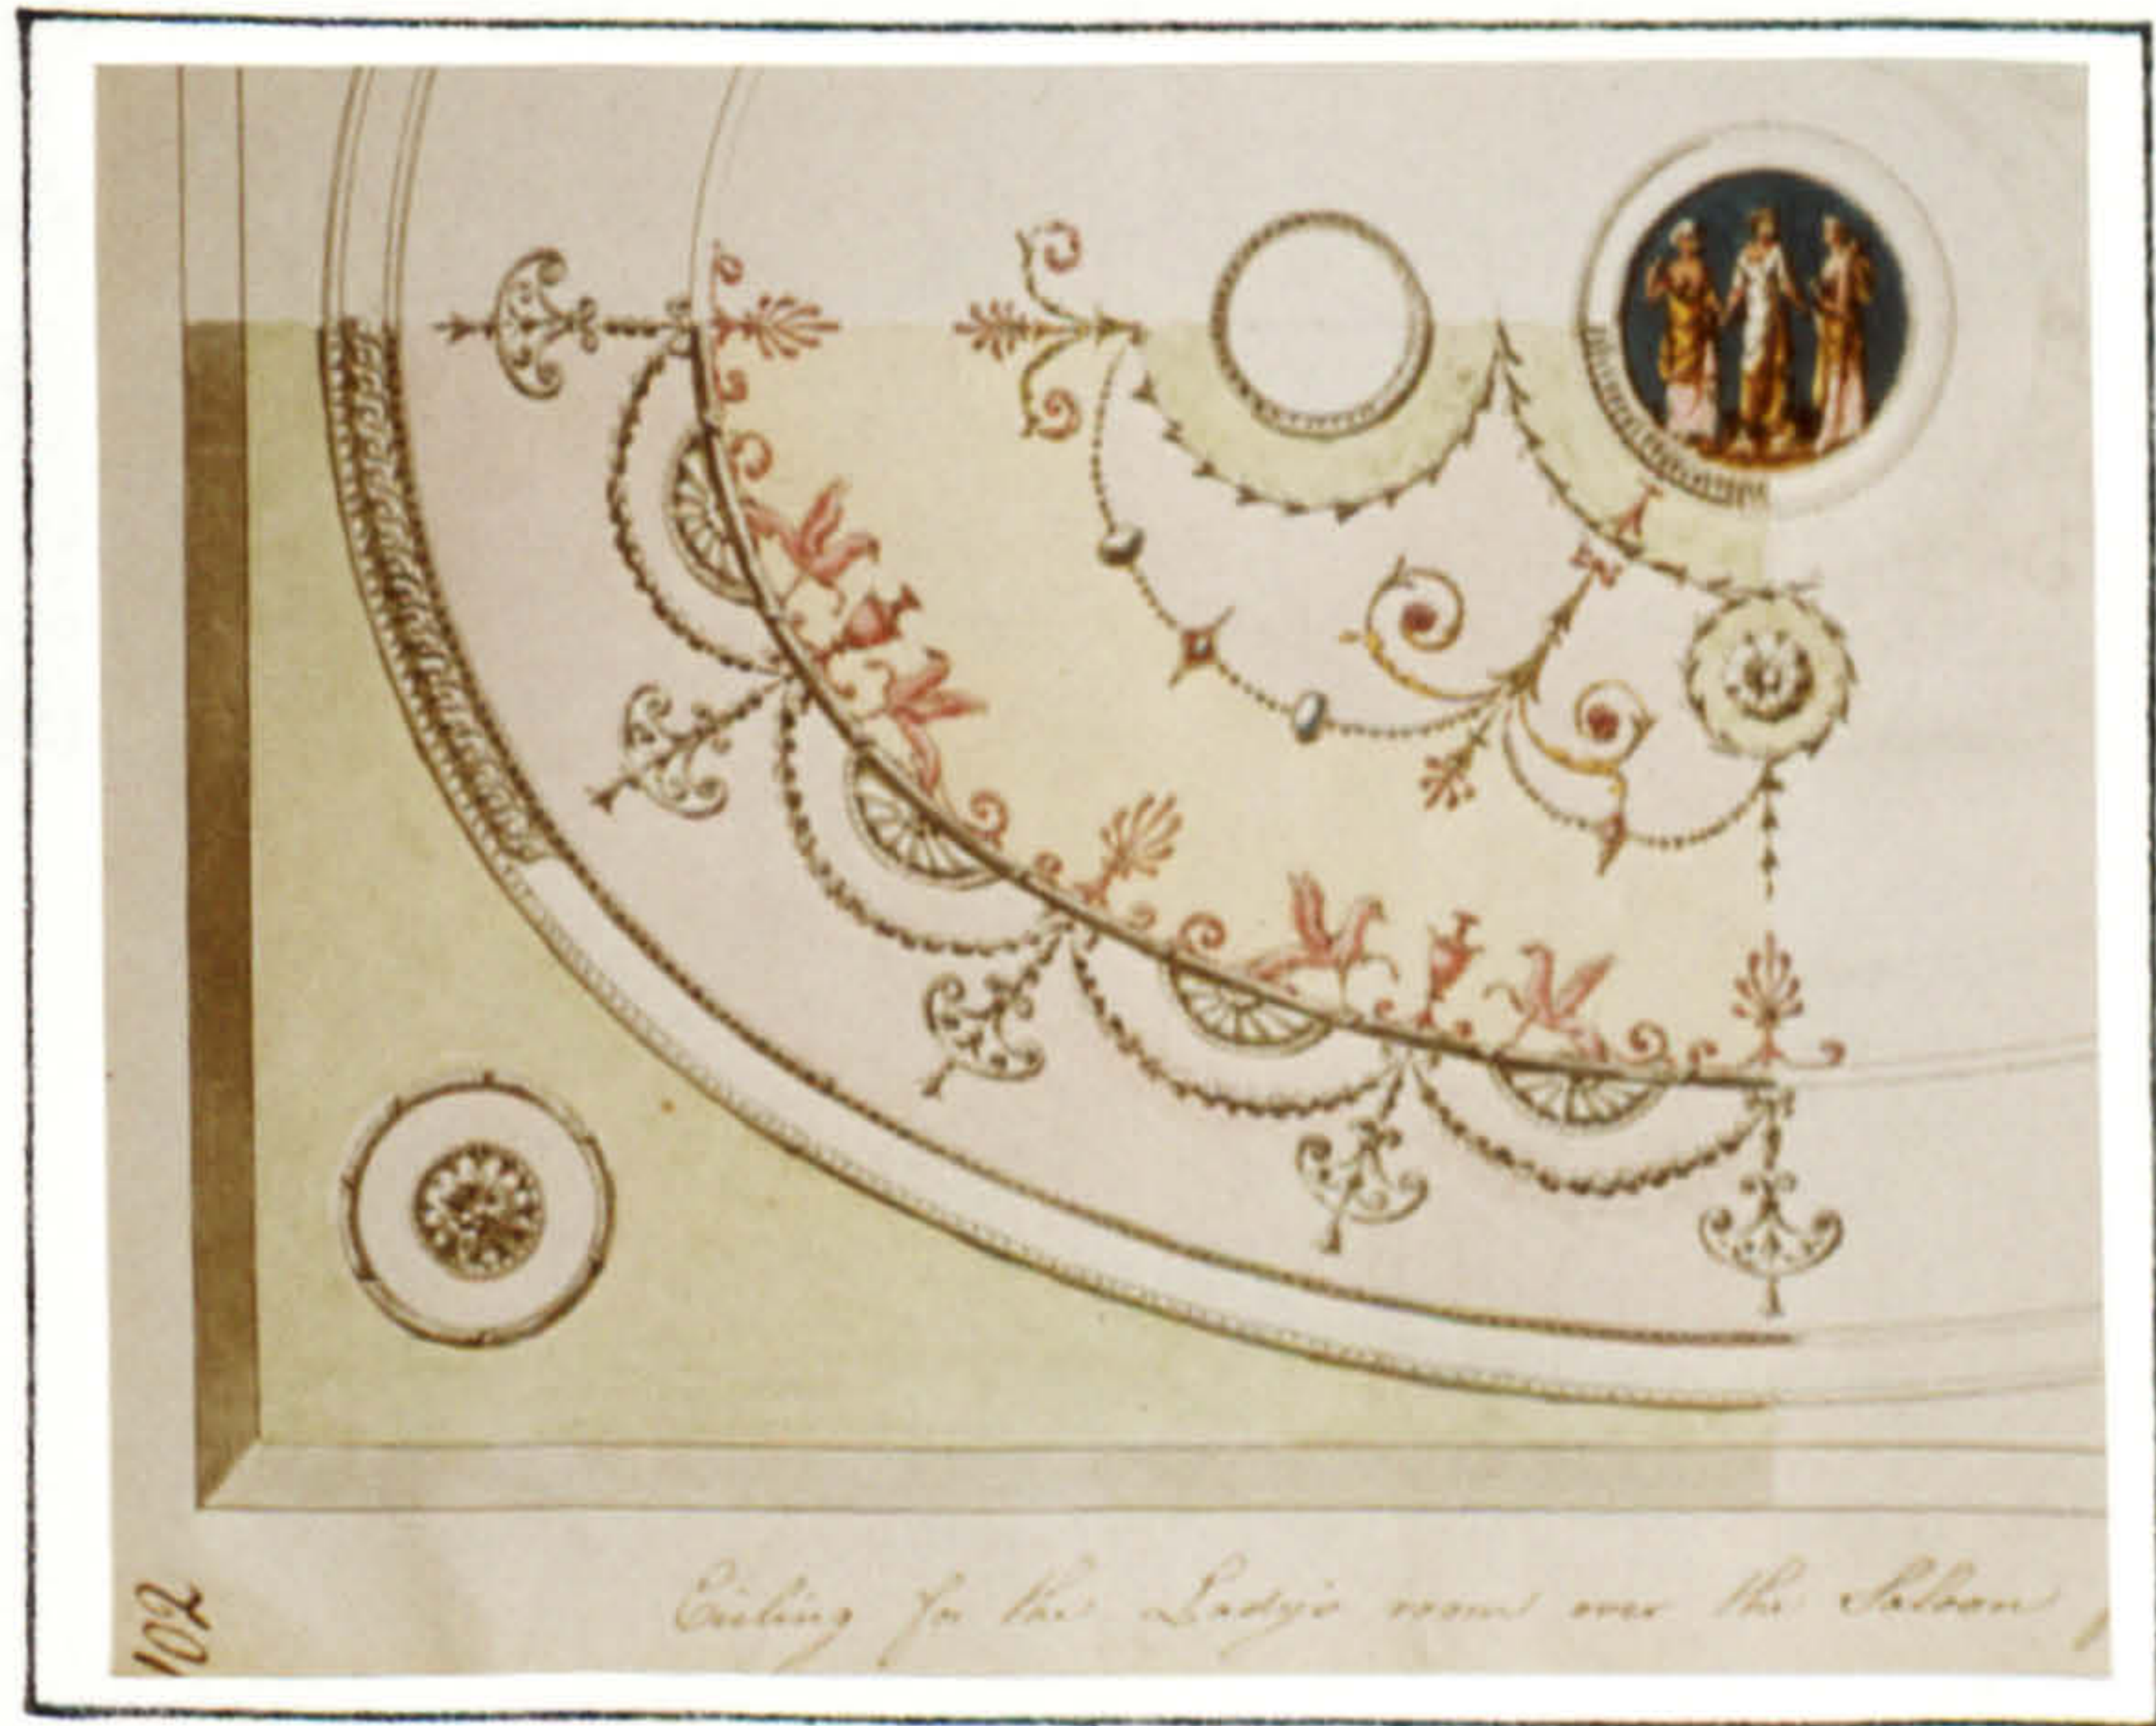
ROBERT ADAM · CEILING FOR LADY'S ROOM
